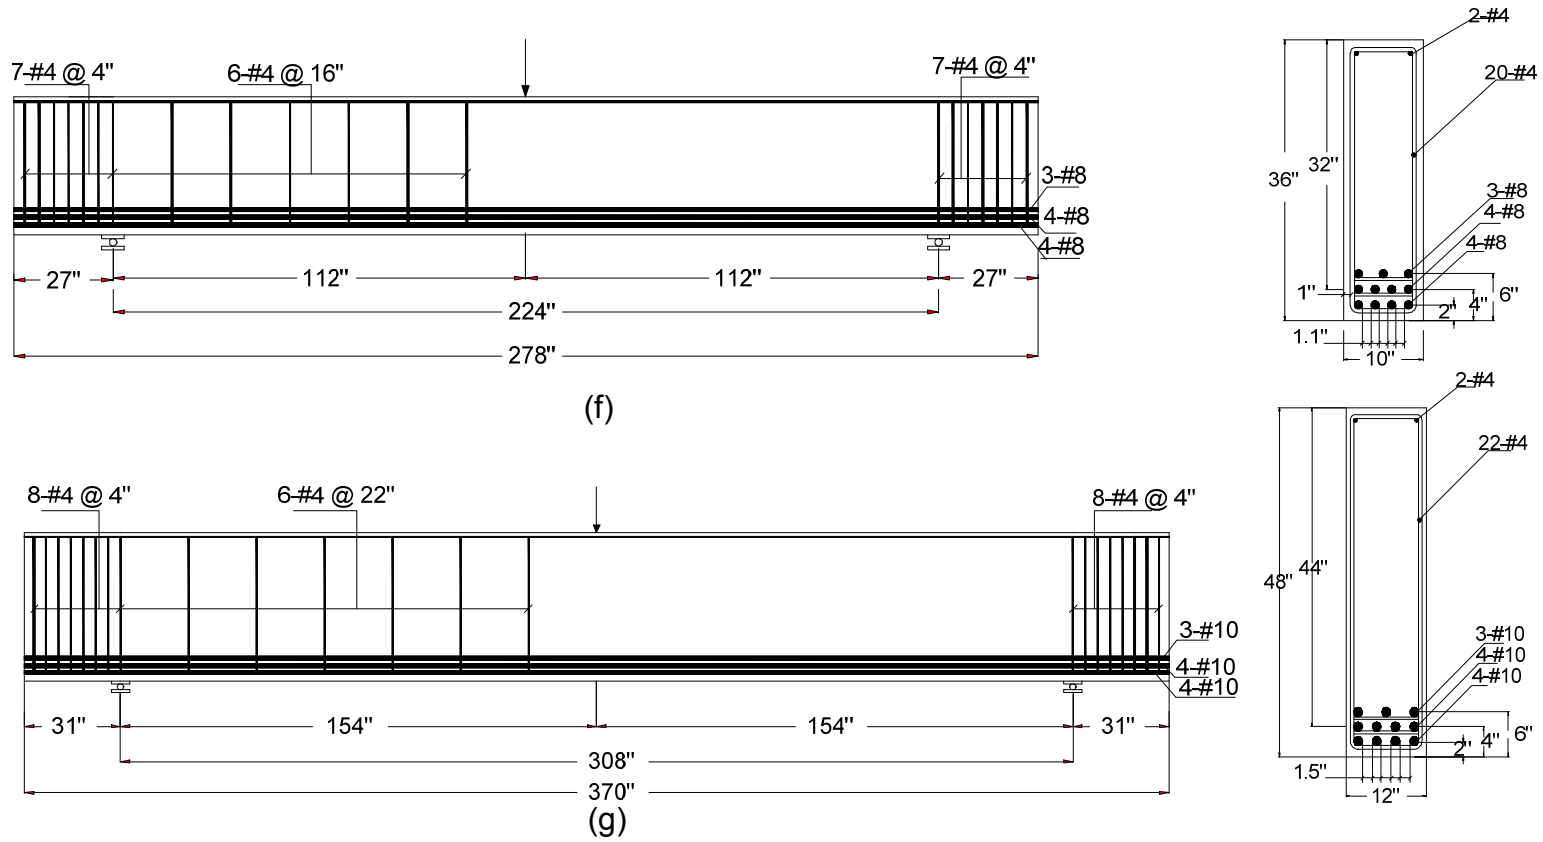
Geometry and reinforcement details of the large-scale RC and SFRC beams; (f) SFRC36; (g) SFRC48 (in. = 25.4 mm).
